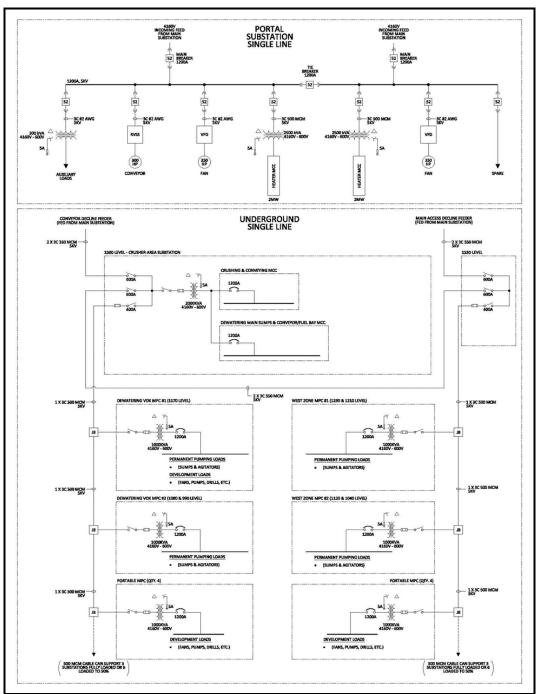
Portal Substation and Underground Single Line Diagrams
